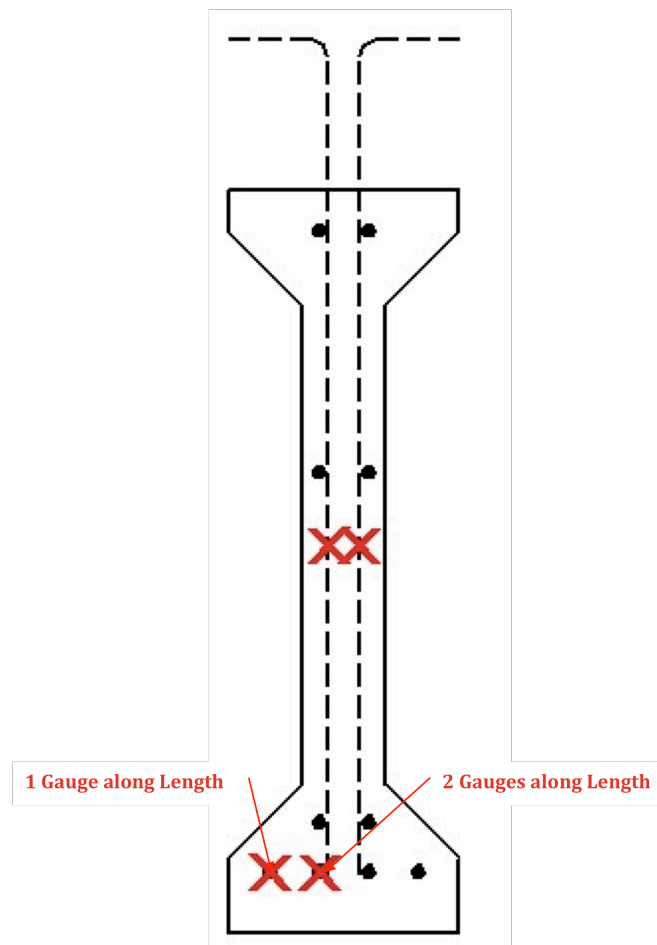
Girder Cross-Section Strain Gauge Locations
